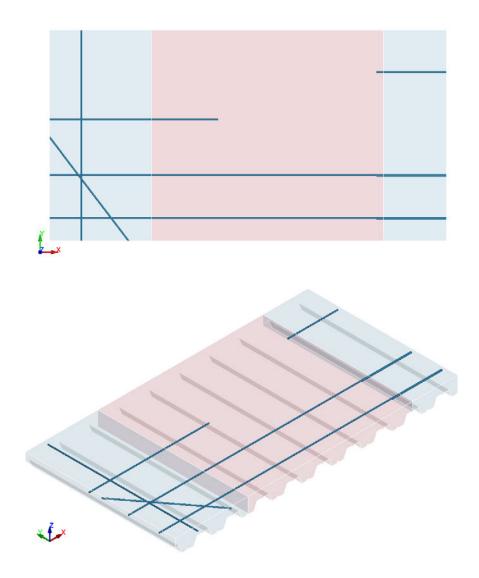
Beam elements representing rebars for Slab 3 (Model 2, Task 3).
